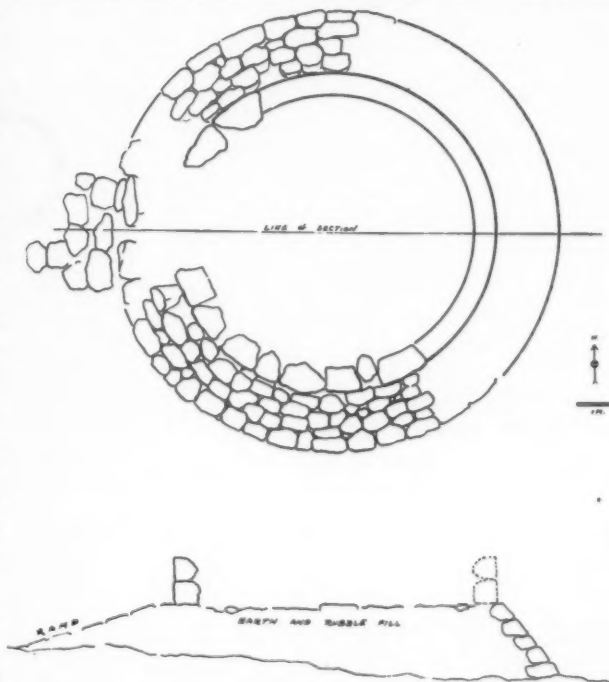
SKETCH PLAN OF ROUND TOWER ABOVE NEMEA STATION
